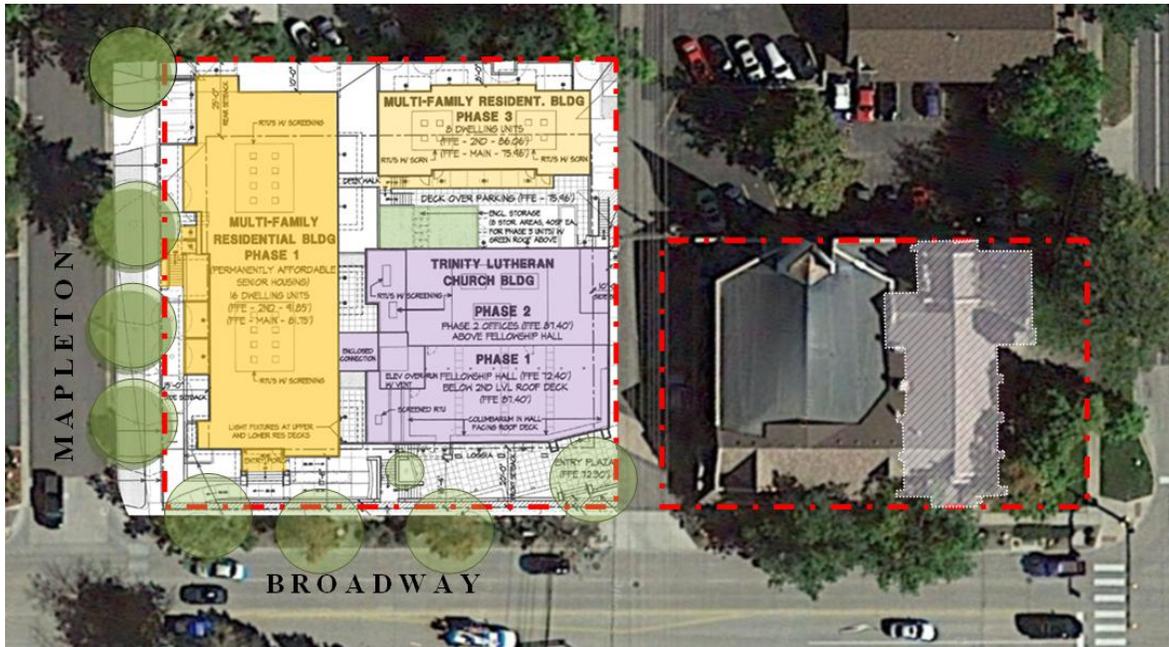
Site Plan, also illustrating area of existing church to be landmarked (in purple)
